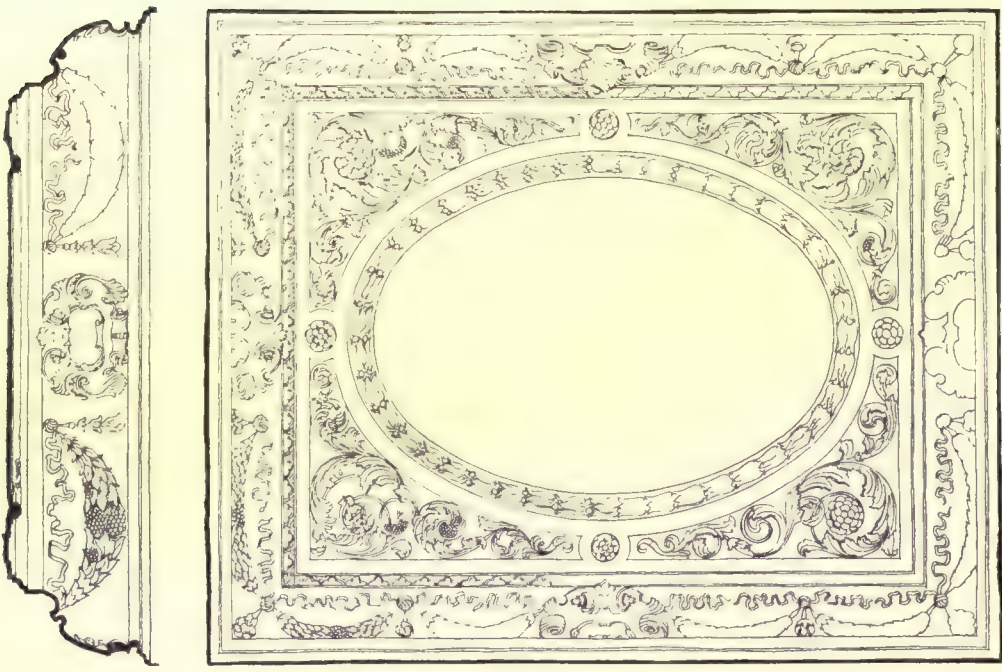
Ceiling of Porch to Great Hall, Kirby Hall, Northants.
